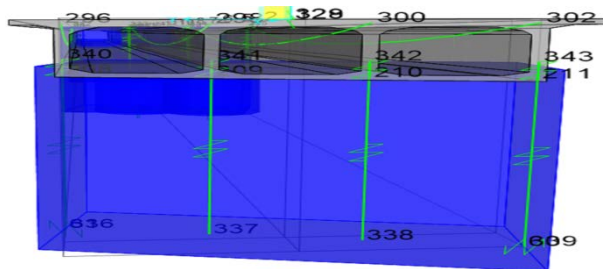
View of 91/5 highway over-crossing in CSi bridge
